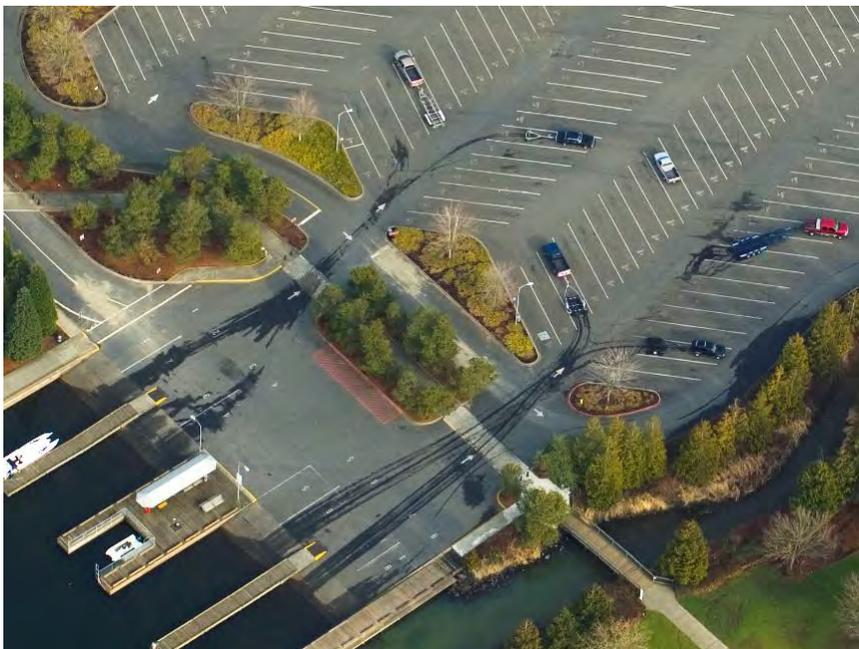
Aerial photo, looking NE towards boat ramp lanes and parking lot (Staging Area) in background. Mouth of Johns Creek in lower center and lower right of photograph.
